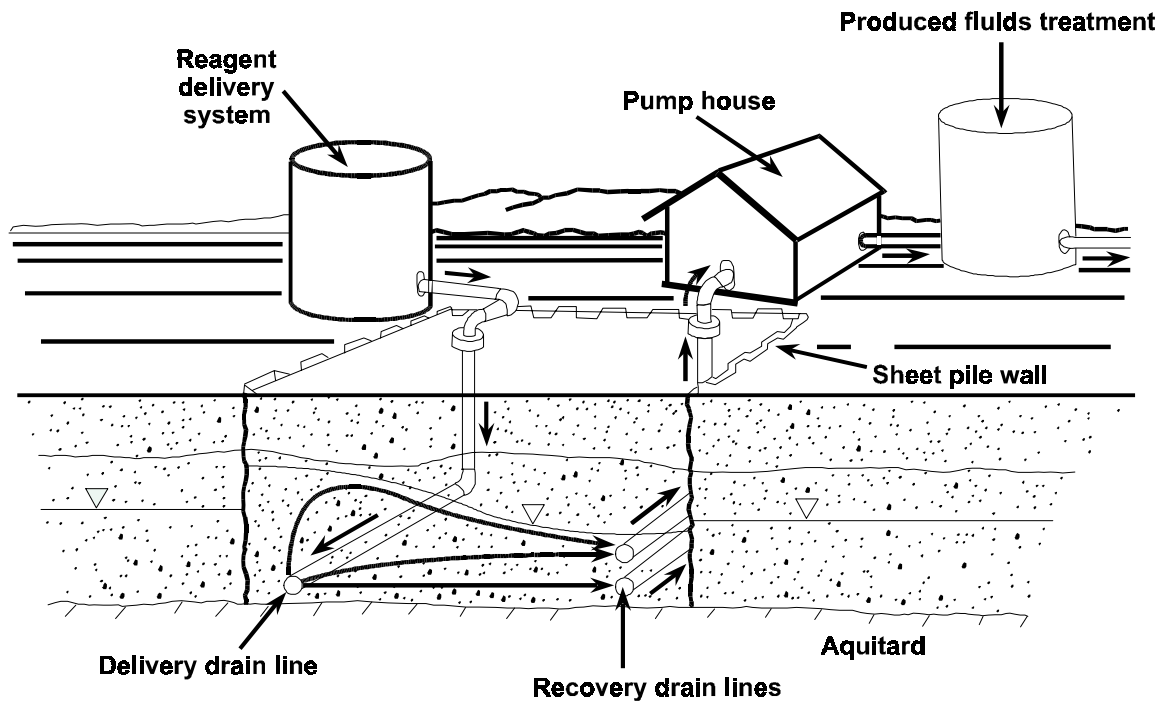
Specific example of sheet pile walls used in this case to aid in recovery of ground water (from Wastech, 1993).
